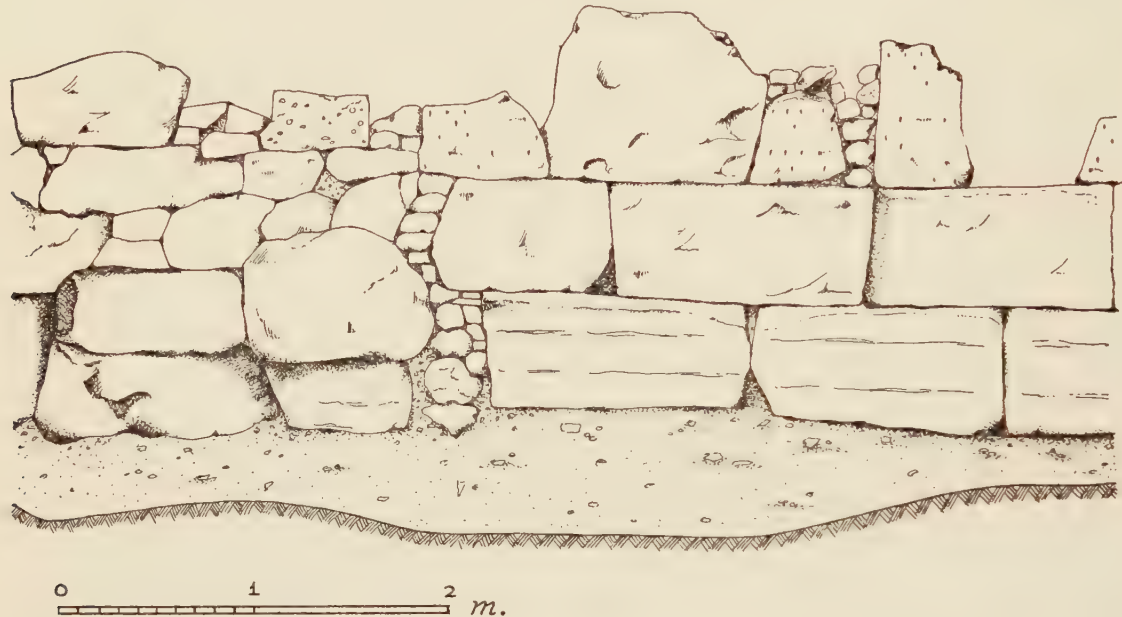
Elevation of West Drain Wall in front of House C, Rooms 4-5, Showing Change of Construction.
